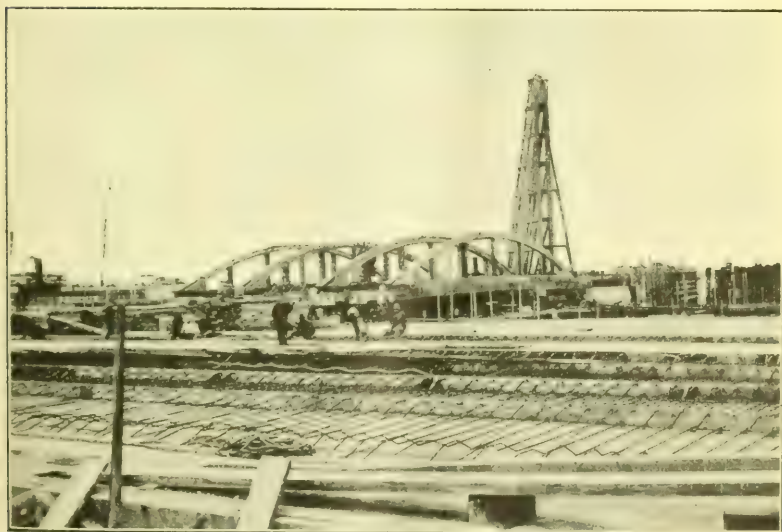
TENSION REINFORCEMENT AND TEMPLATES FOR HOLDING IN POSITION.
